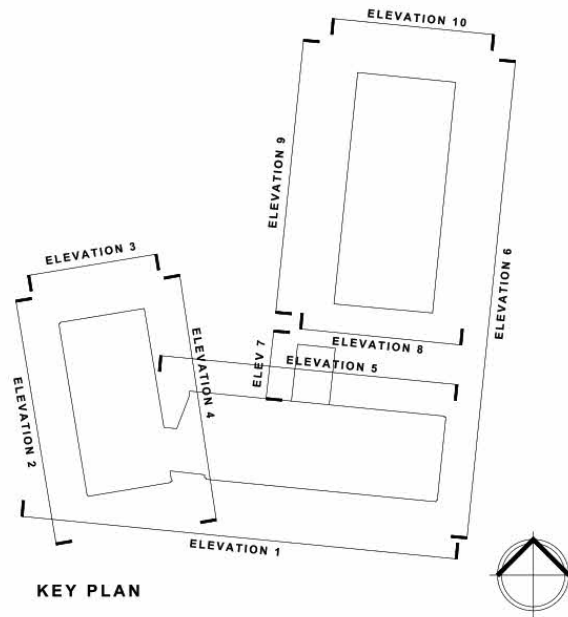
Elevation Key Plan - drawing 1600529.2.20 Drawn by AC by Marrons Planning
